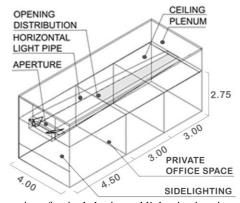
Perspective of a single horizontal light pipe in private office spaces
